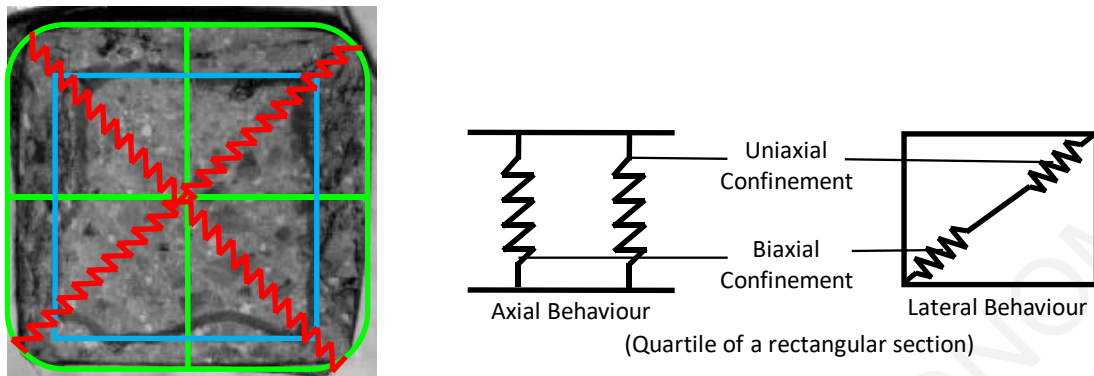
FRP-confined rectangular concrete section modelling using ‘generalized’ springs.
